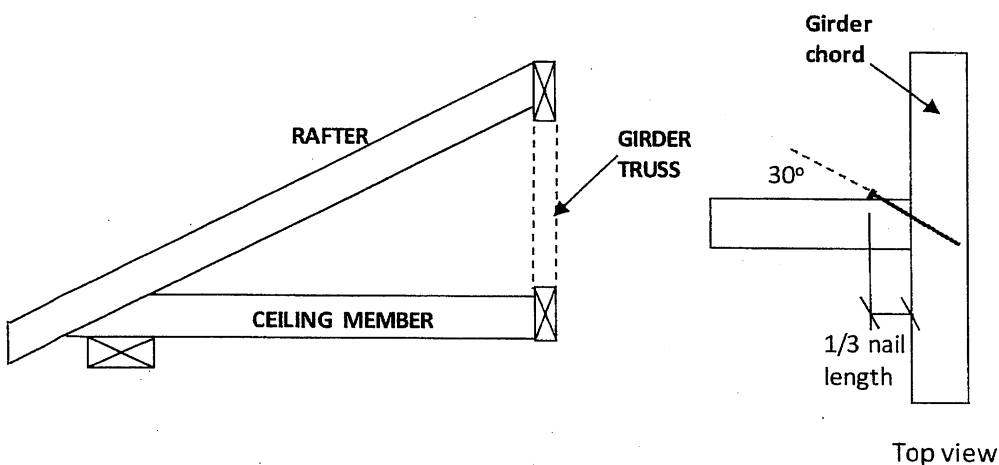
Toe-Nailing Rafter / Ceiling Member to Girder Truss
